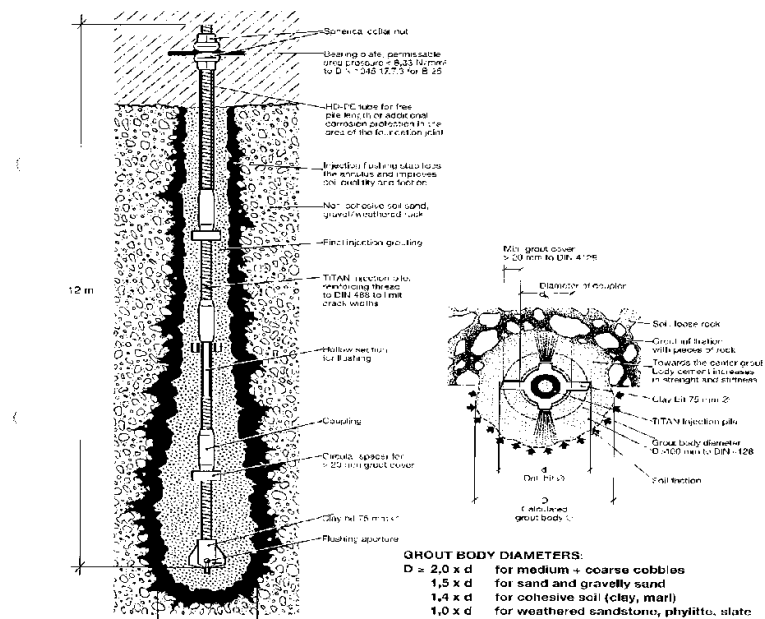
The Micro pile System Cross-Section and Plan Section
